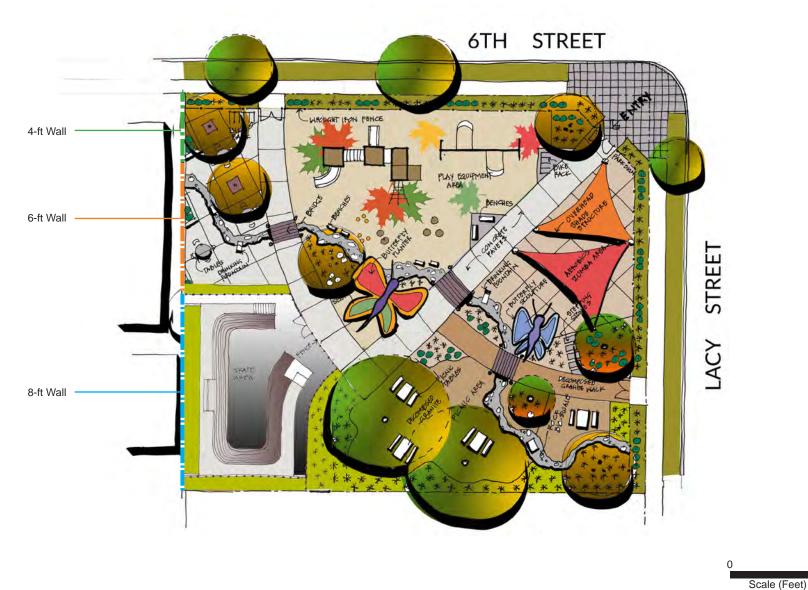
Conceptual Site Plan - 6th Street Site (Site 1)
